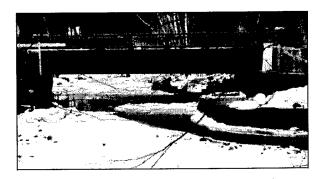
North Woodstock, New Hampshire, 12 December 2002.
